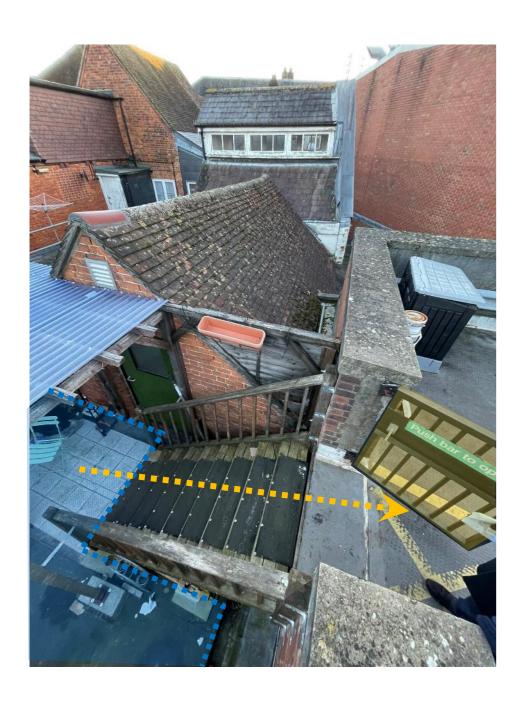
Existing Fire Escape route from The Globe Inn to the Servicing Roof Top.
